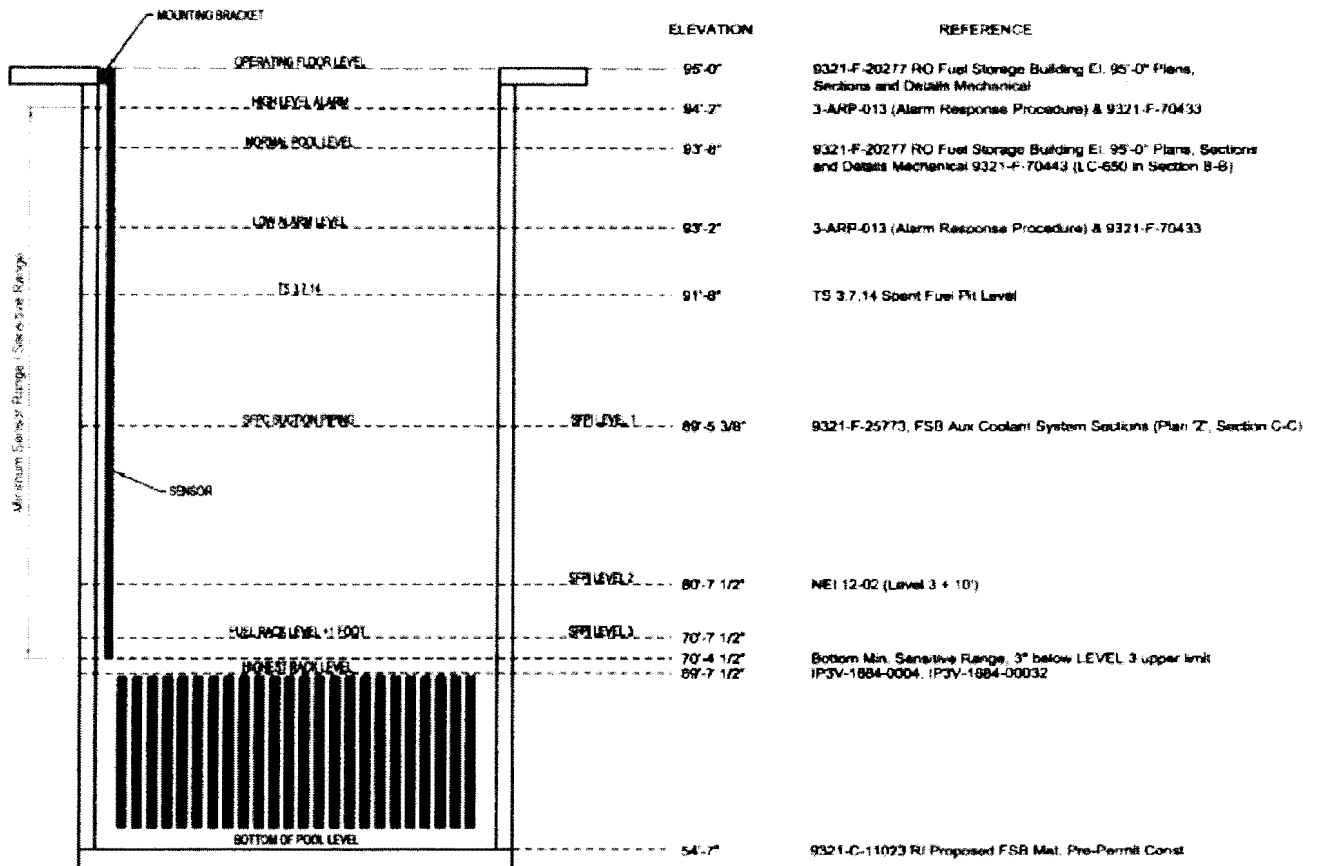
Unit 3 SFP Elevation View with Levels Indicated
